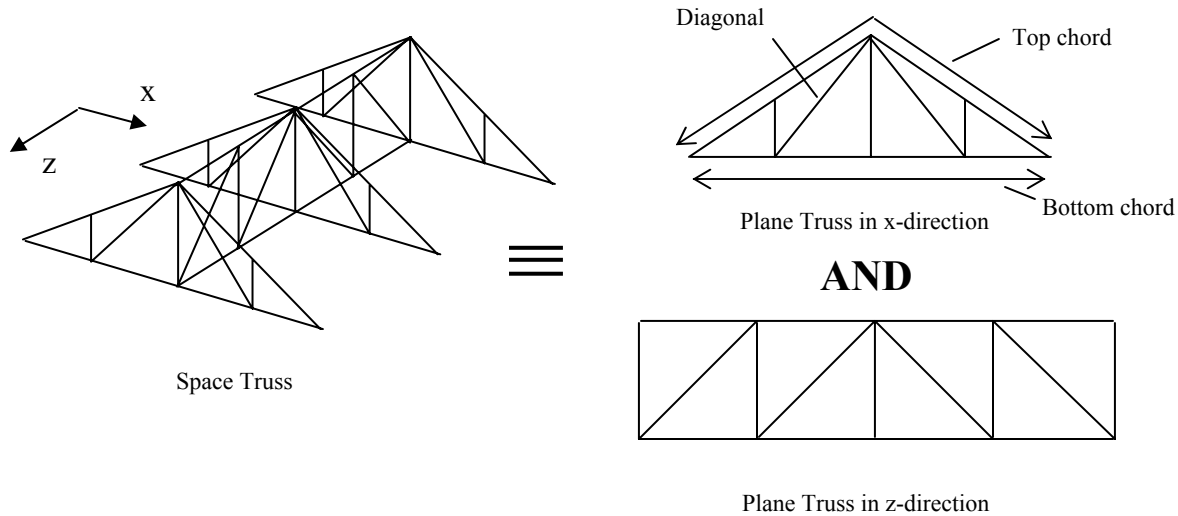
Idealizing a Space Frame as 2 Plane Trusses
